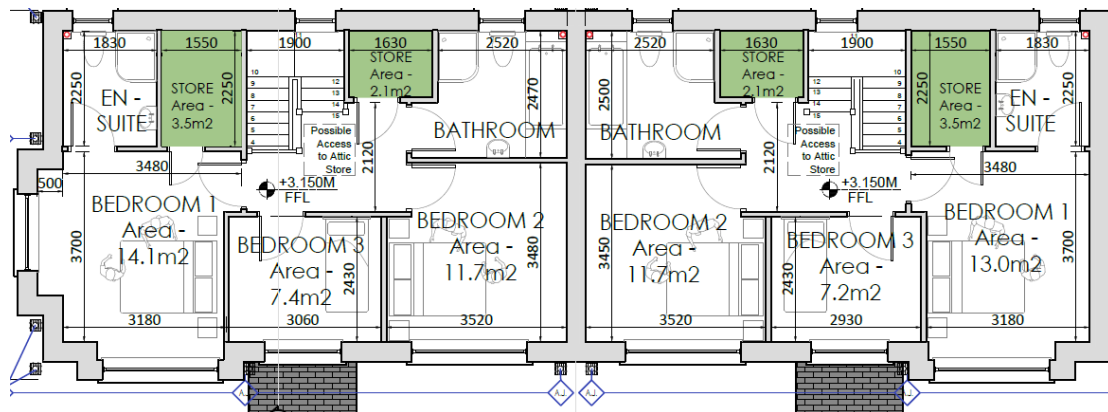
Typical first floor plan of House Type DD (left) and House Type D (right)
